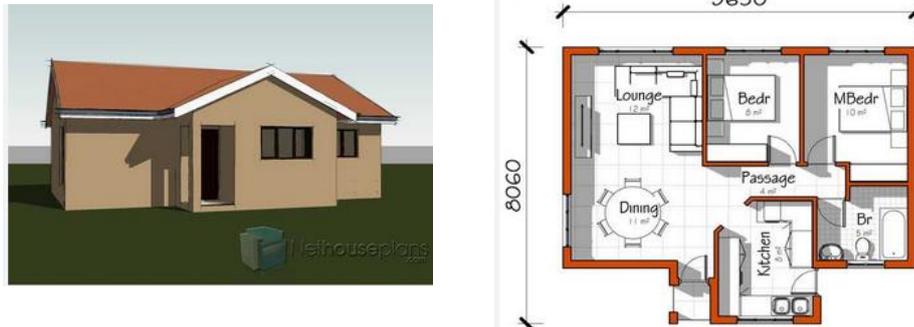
Room House Plans Low Cost Bedroom Plan Nethouseplansnethouseplans / Source: <https://www.midotrust.com/>
